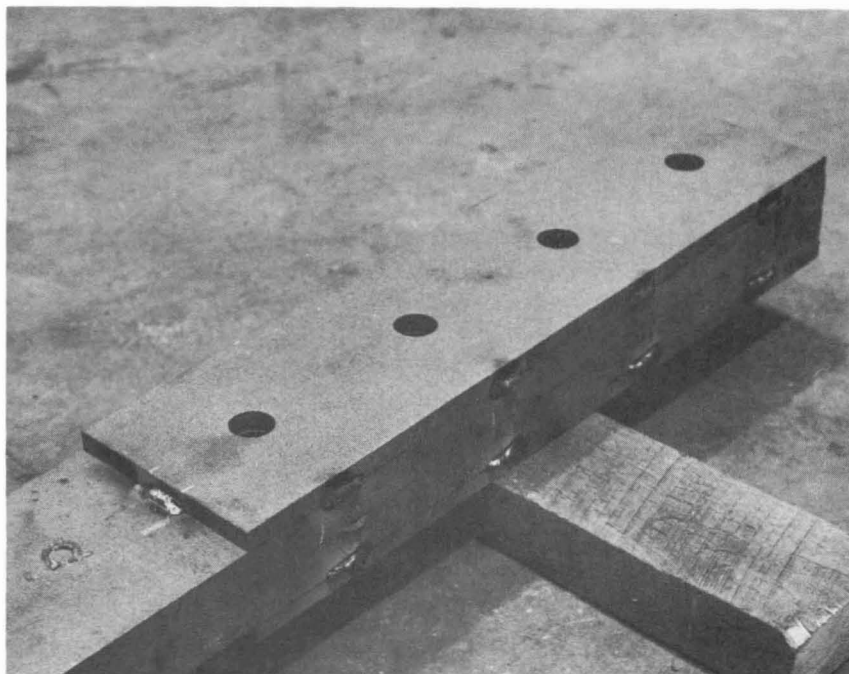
Tack Welding of Filler Plates and Washers
